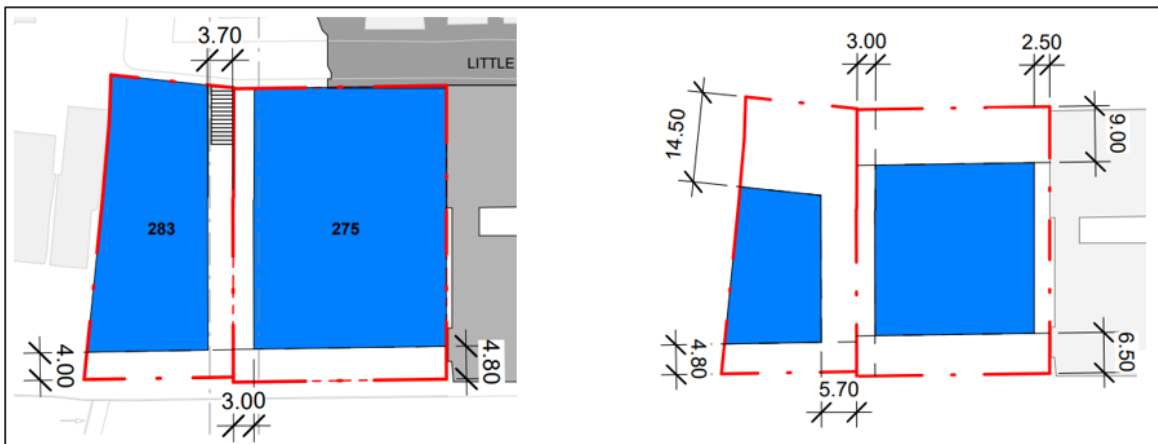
Concept scheme setbacks ground floor (left) and from Level 7 and above (right) (source: *Grimshaw Architects - urban design package*)
